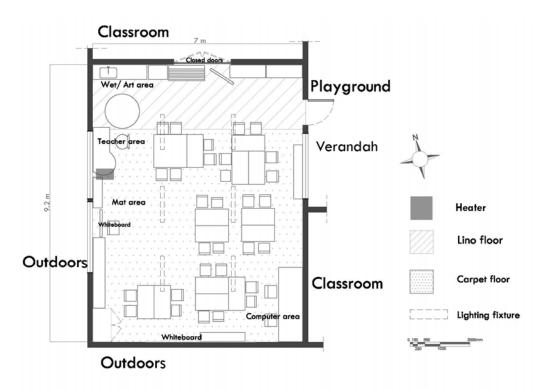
CLYDE QUAY CLASSROOM'S FLOOR PLAN.
